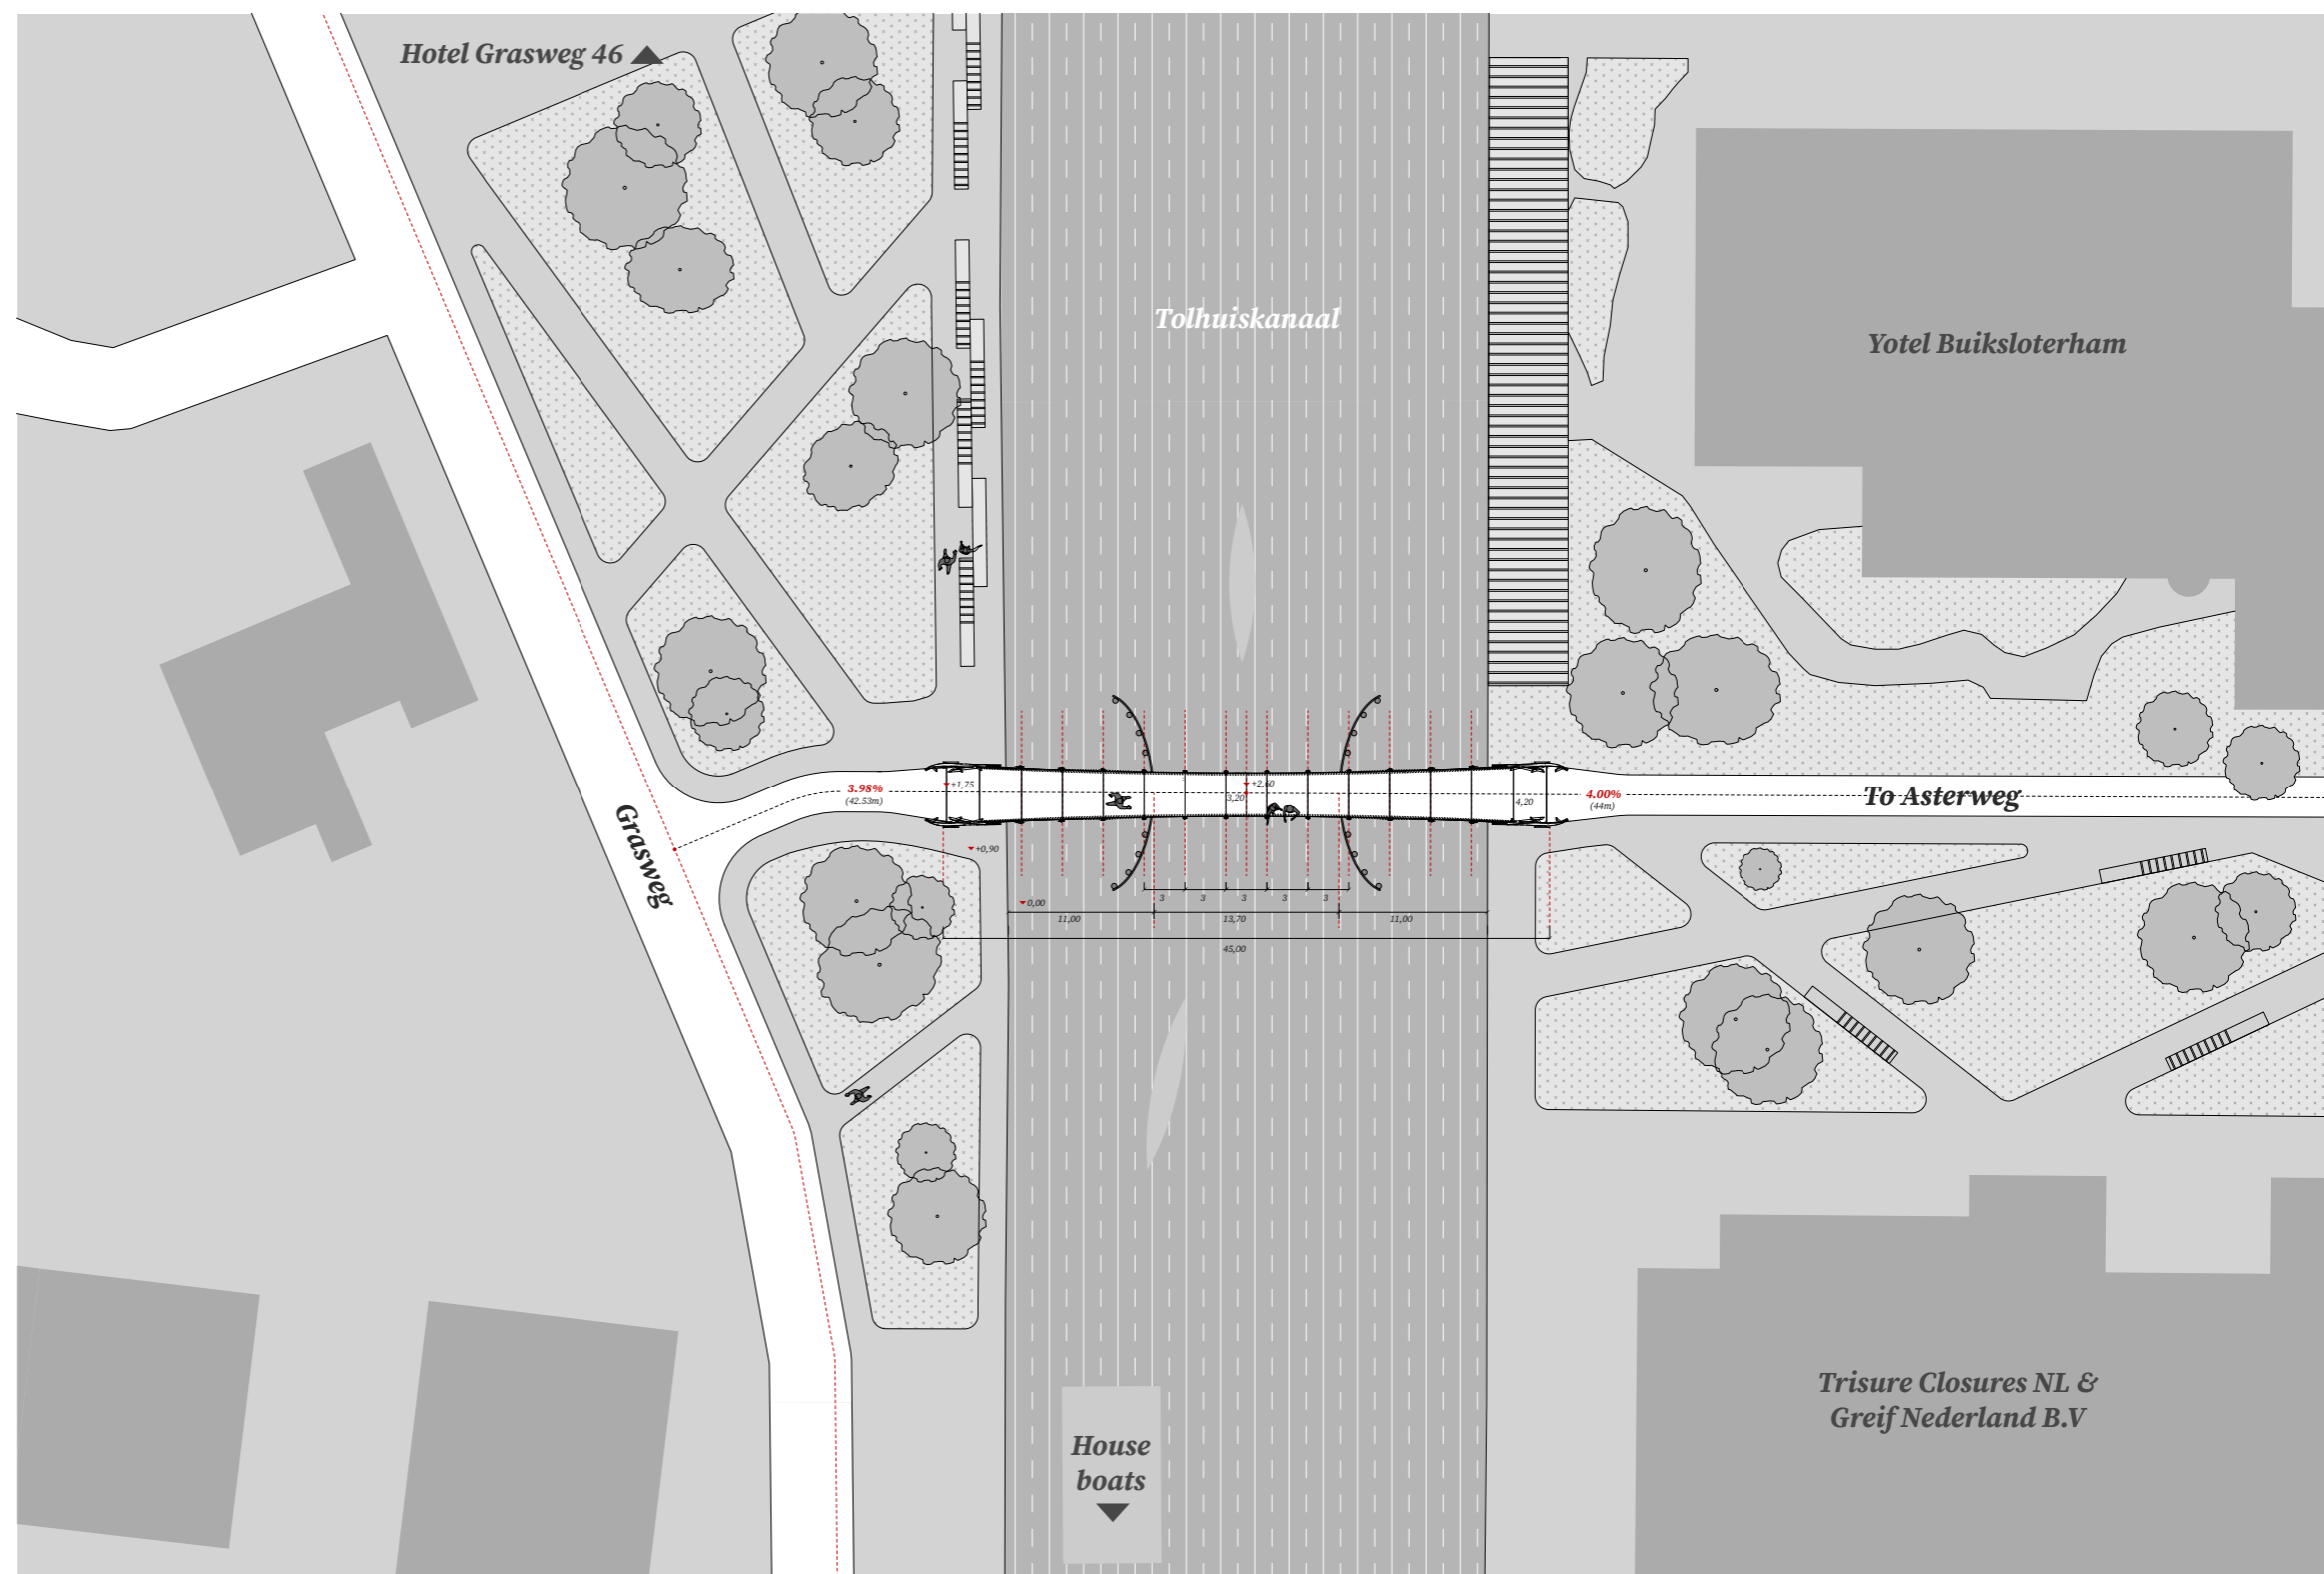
Urban site plan with the proposed bridge in relation to adjacent buildings on site.
